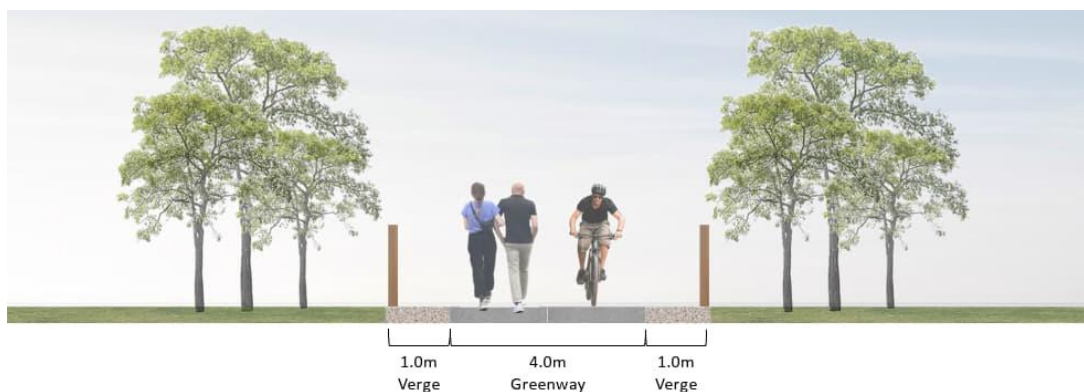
Typical Cross Section of 4.00m Wide Greenway
